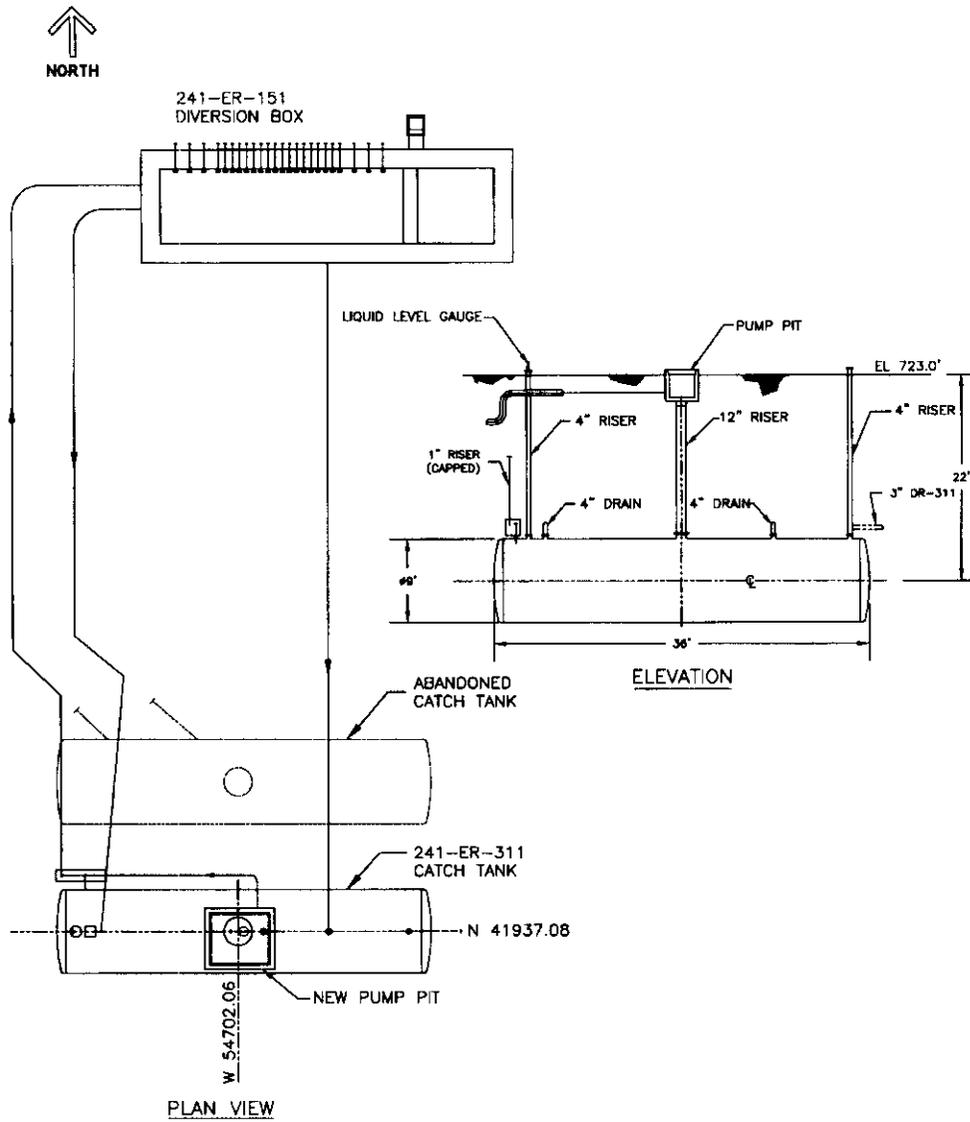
SITE PLAN – 241-ER-311 Catch Tank.
